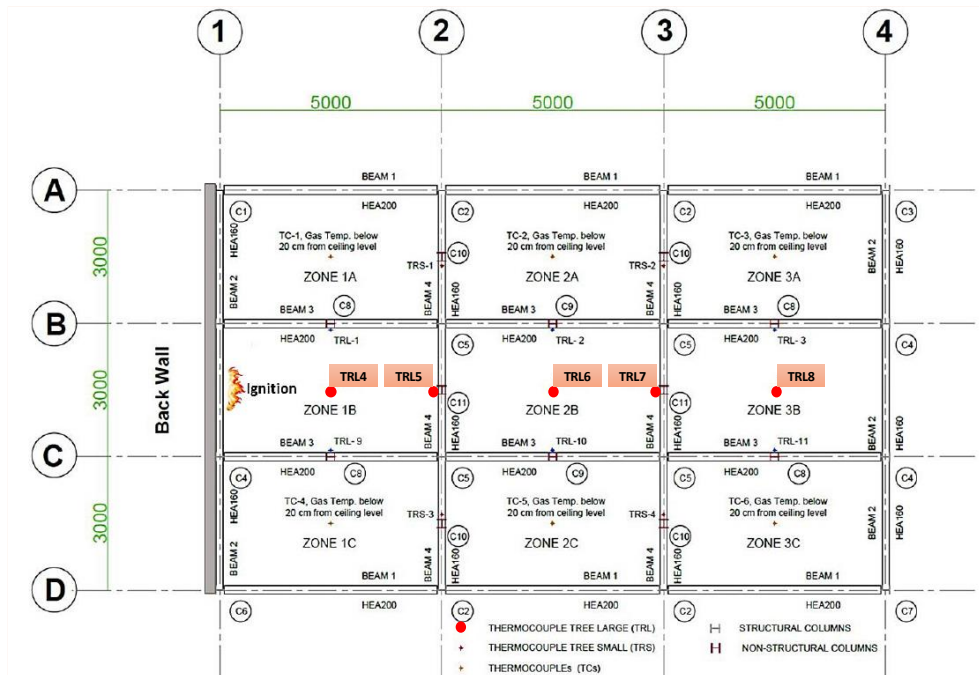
Layout plan of the test compartment and location of TRL4 to TRL8 (dimensions in mm)
